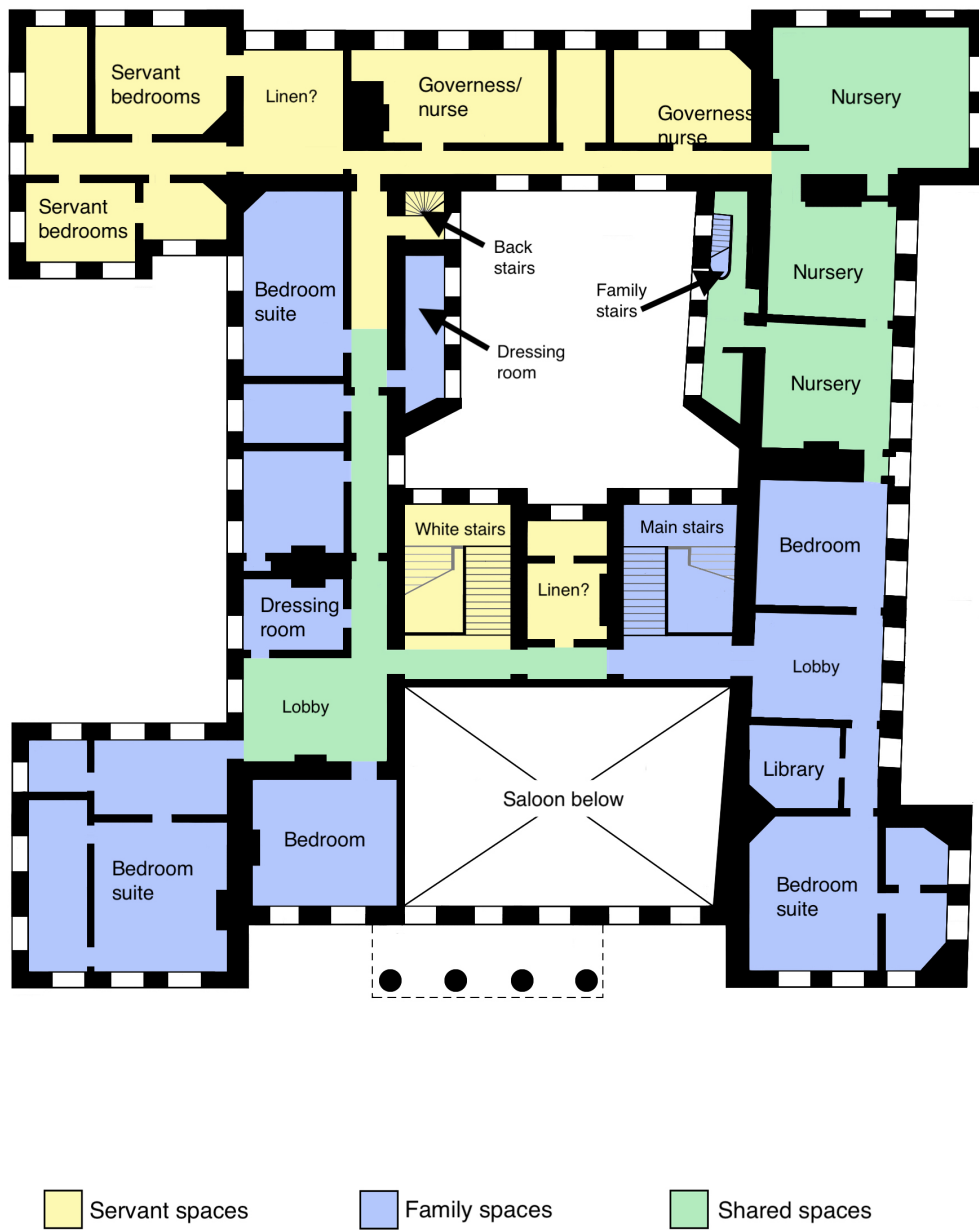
Calke Abbey c1794 Phase 2 second floor plan
